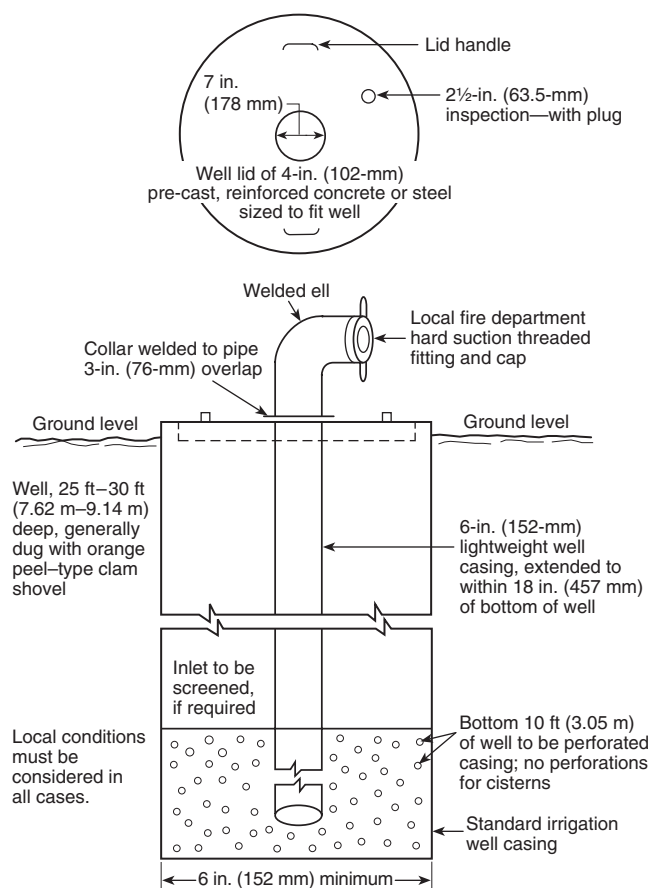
(b) Typical well (cistern) with dry hydrant installed.
